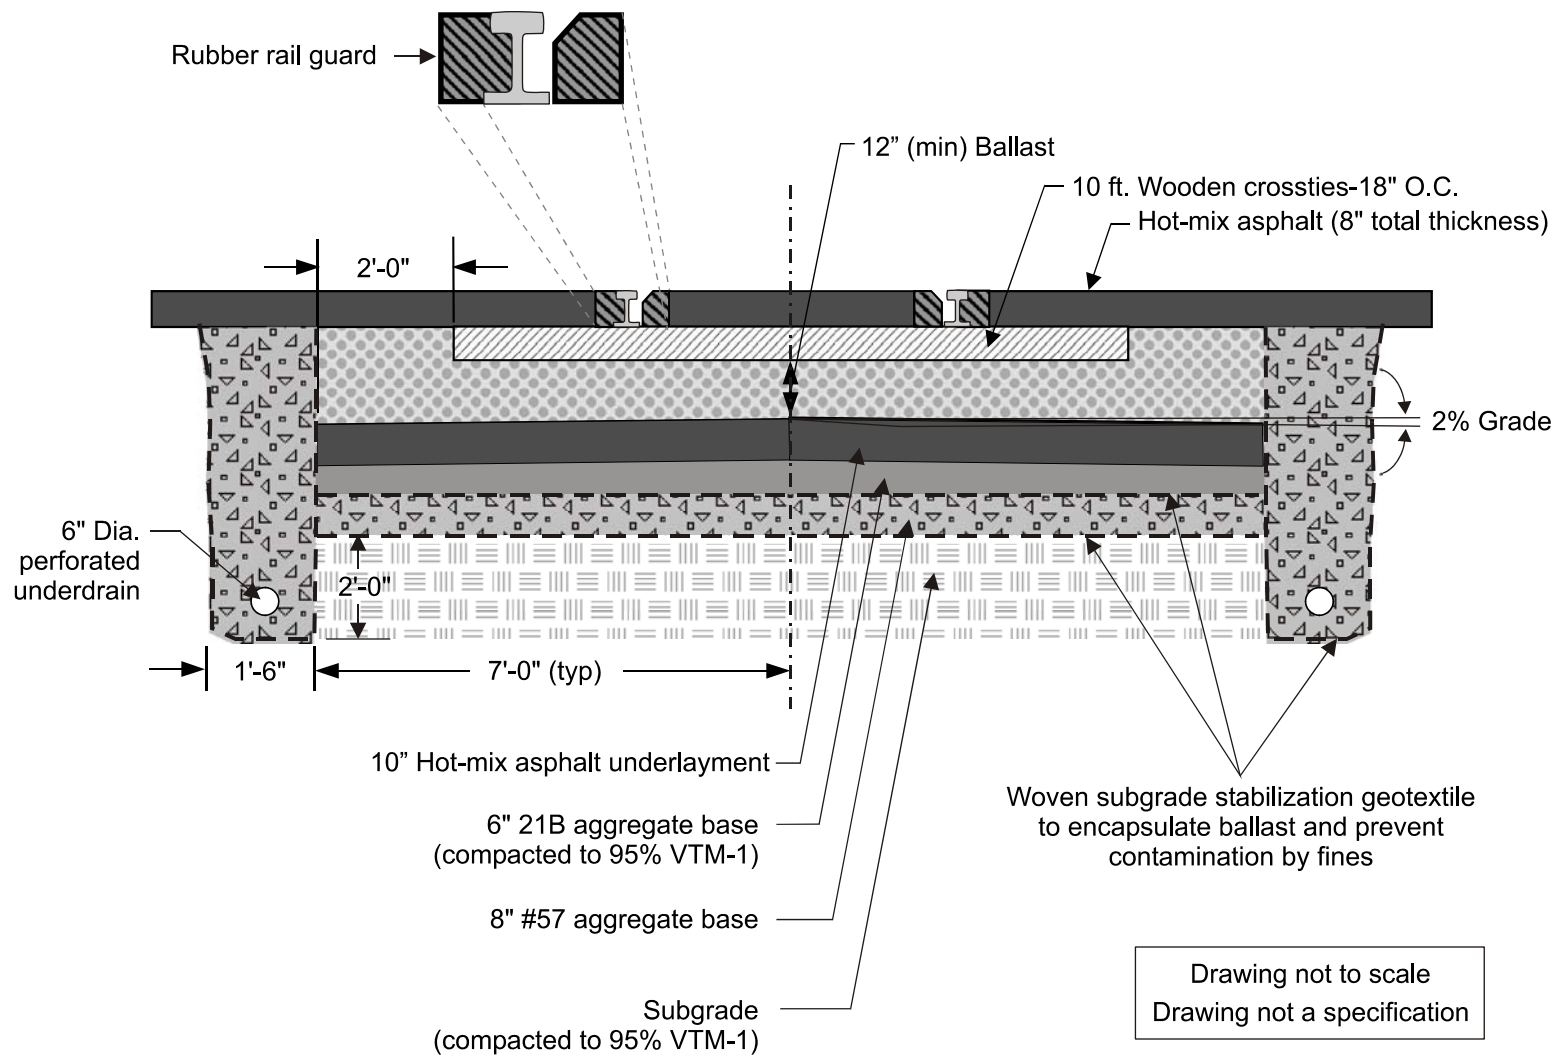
Profile View of Reconstructed Rail Crossing Using High Rut-Resistant Hot-Mix Asphalt.
